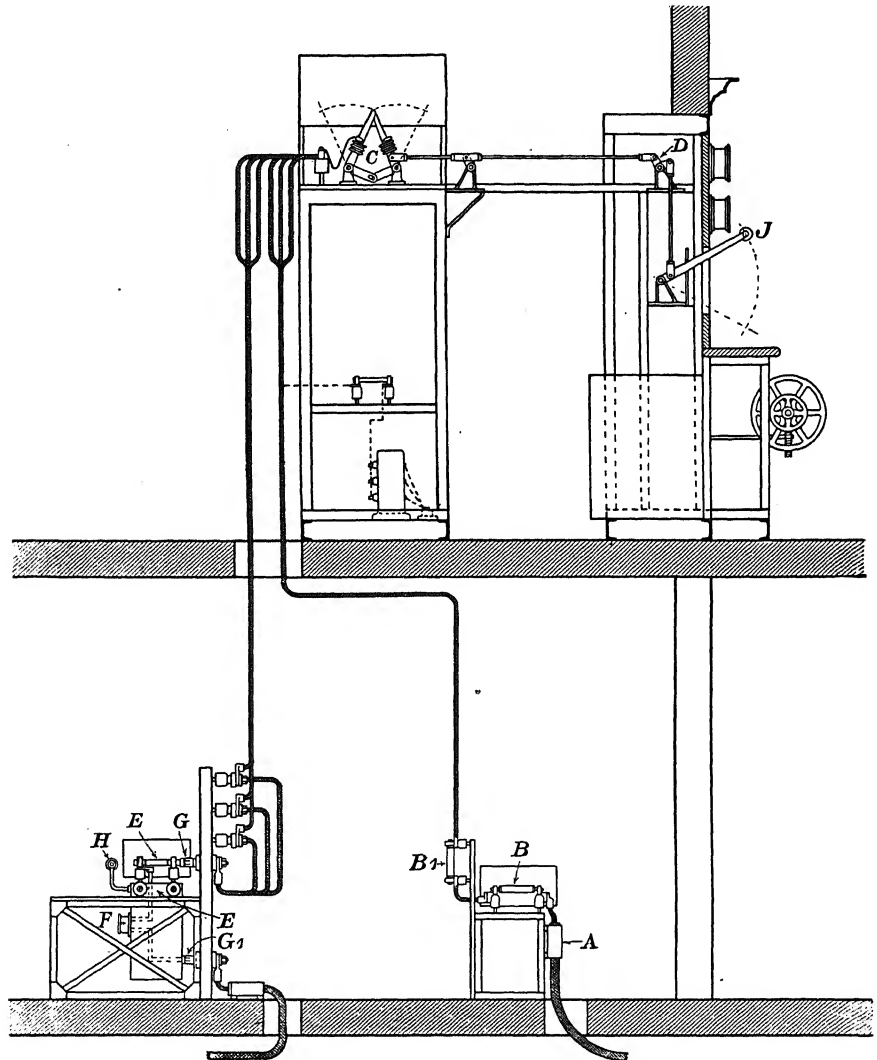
Section showing general arrangement of Berlin switchgear.
